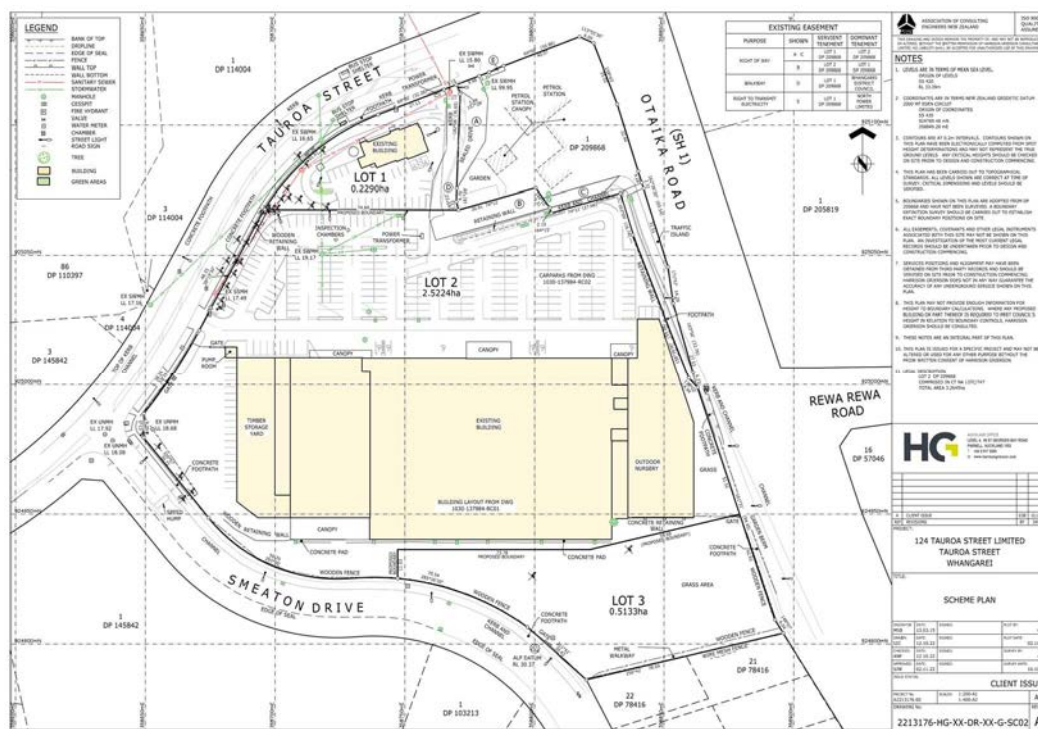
Subdivision scheme plan (Harrison Grierson)
